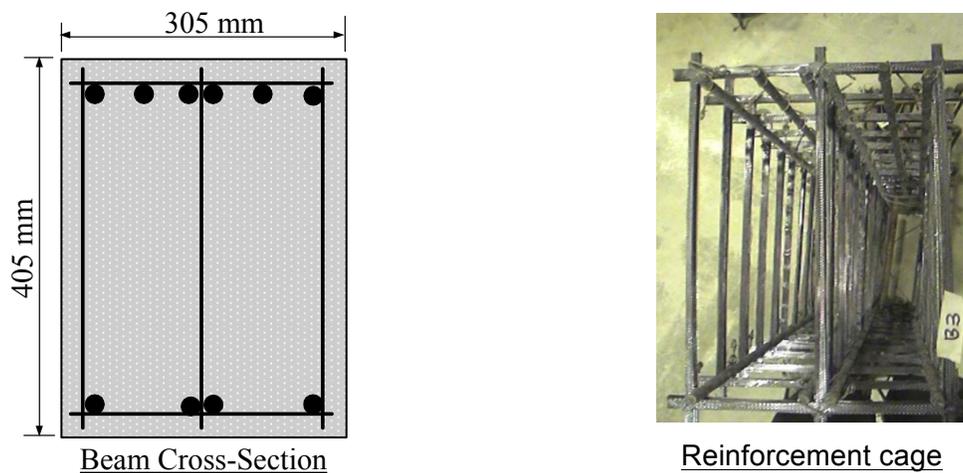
Beam Cross-sectional Geometry and Reinforcement Details
